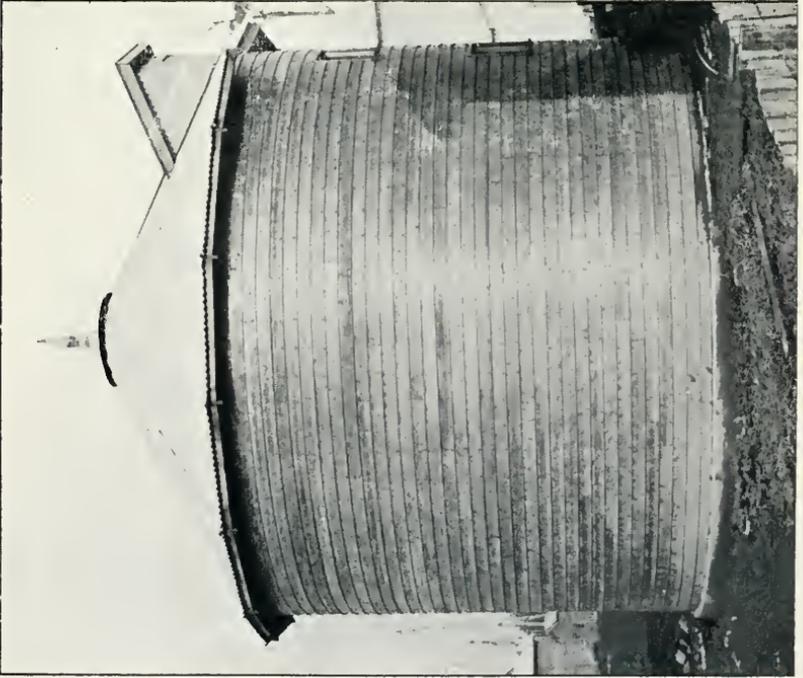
SILO IN BRICK FOUNDATION, OUTSIDE WALLS WEATHERBOARD.
